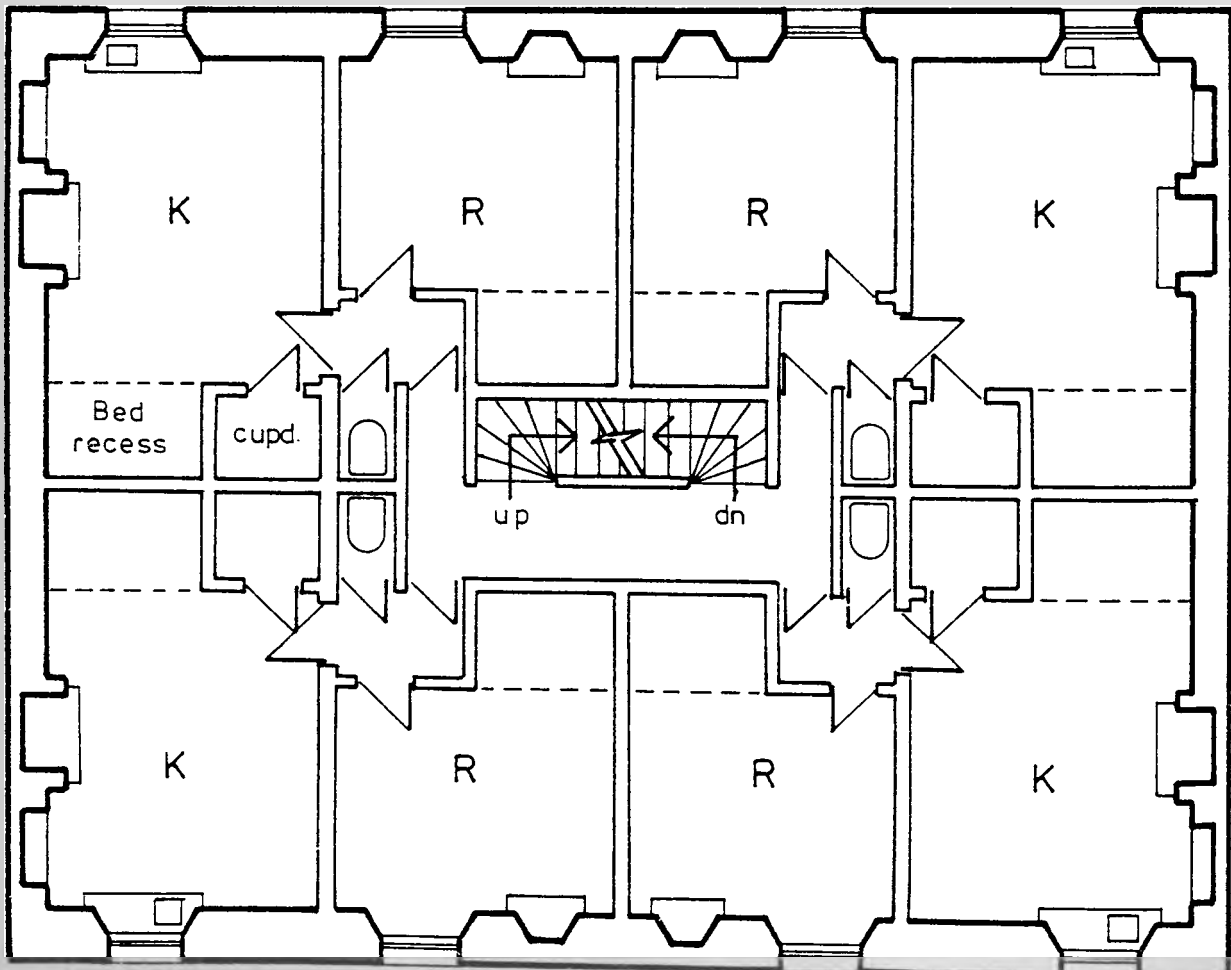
TYPICAL EDINBURGH TENEMENT PLAN 1:100 .
